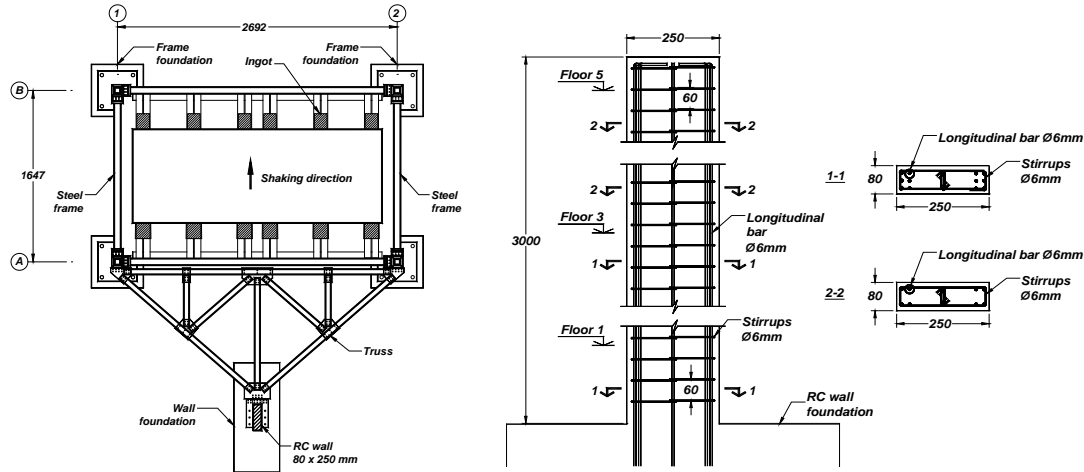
Test unit E1, dimensions in mm. Plan and wall's transverse sections and reinforcement details.
